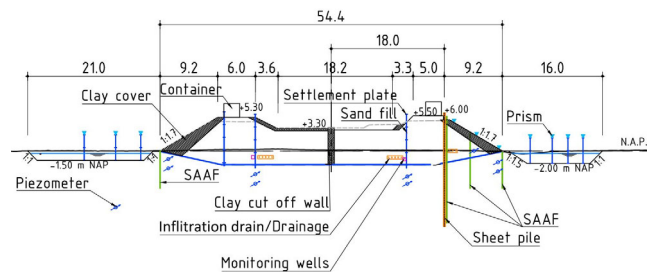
Cross section of ground dike (left) and sheet pile dike (right) with monitoring instrumentation.
